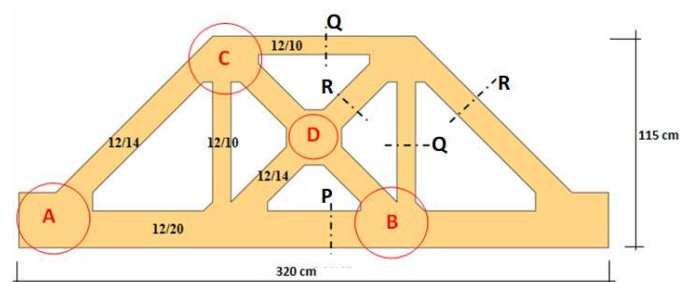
The dimensions of the bamboo reinforced concrete bridge frame
